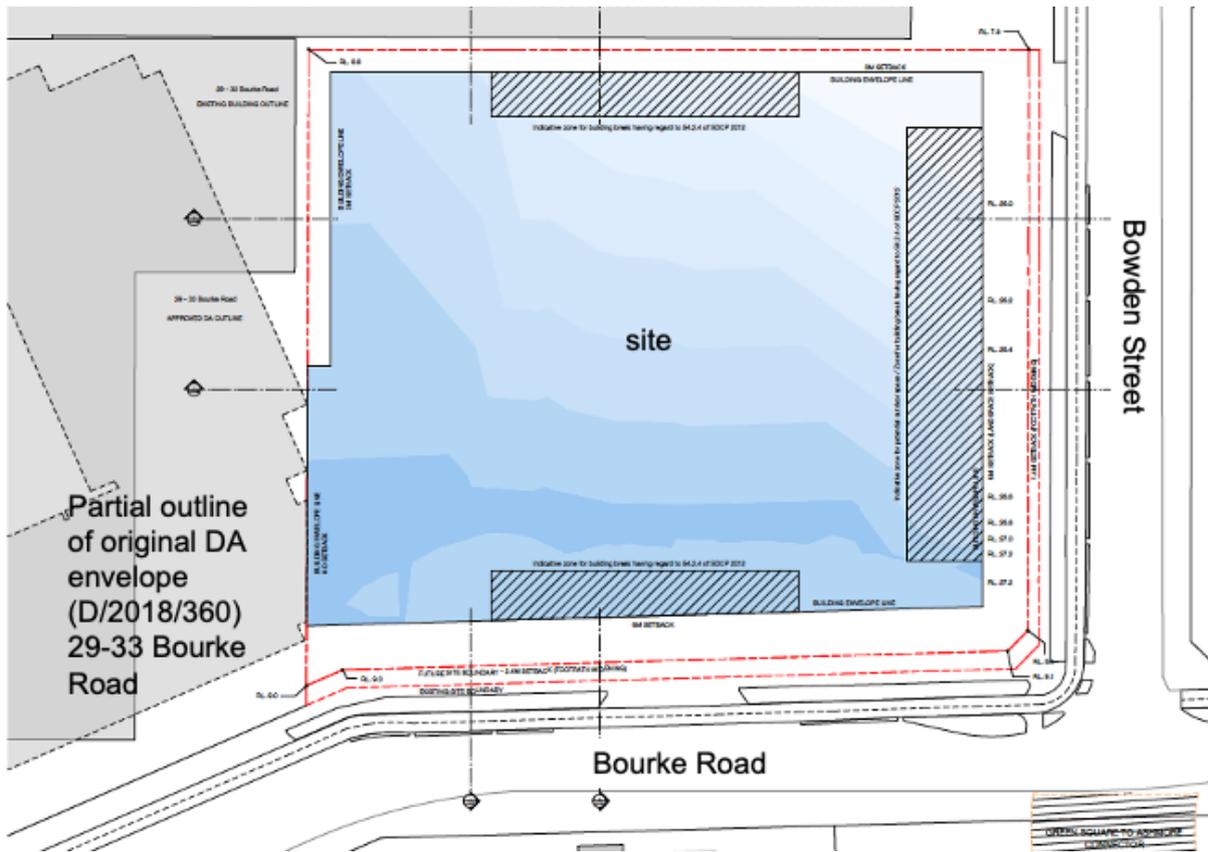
Site plan depicting proposed building envelope of the subject site, and partial outline of original DA envelope (D/2018/360) for 29-33 Bourke Road, Alexandria. Note that D/2018/360/A for 29-33 Bourke Road has since amended the building envelope and is depicted below.
